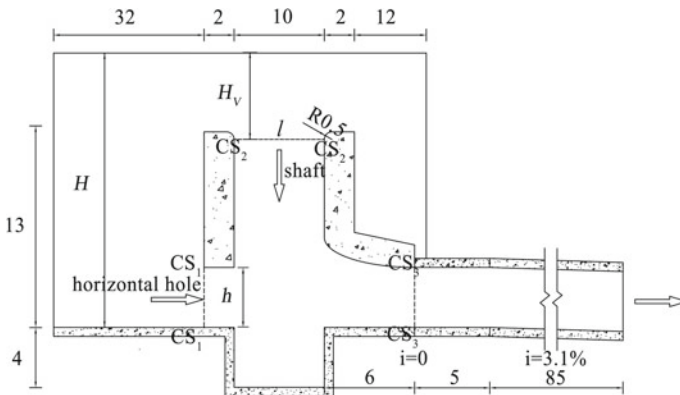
Structural arrangement of the inlet and the analysed scope (unit: m)
